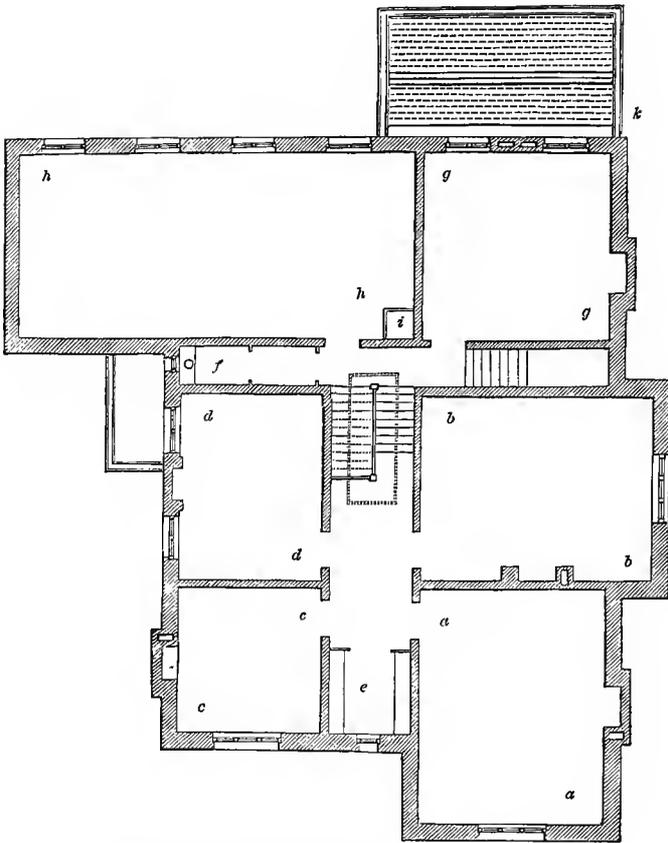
Chamber-floor plan of farmhouse—scale in Plate VIII.
